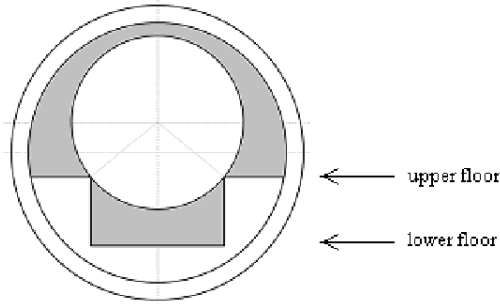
Space of the cross-section of the tunnel to be filled with grout (in grey).
